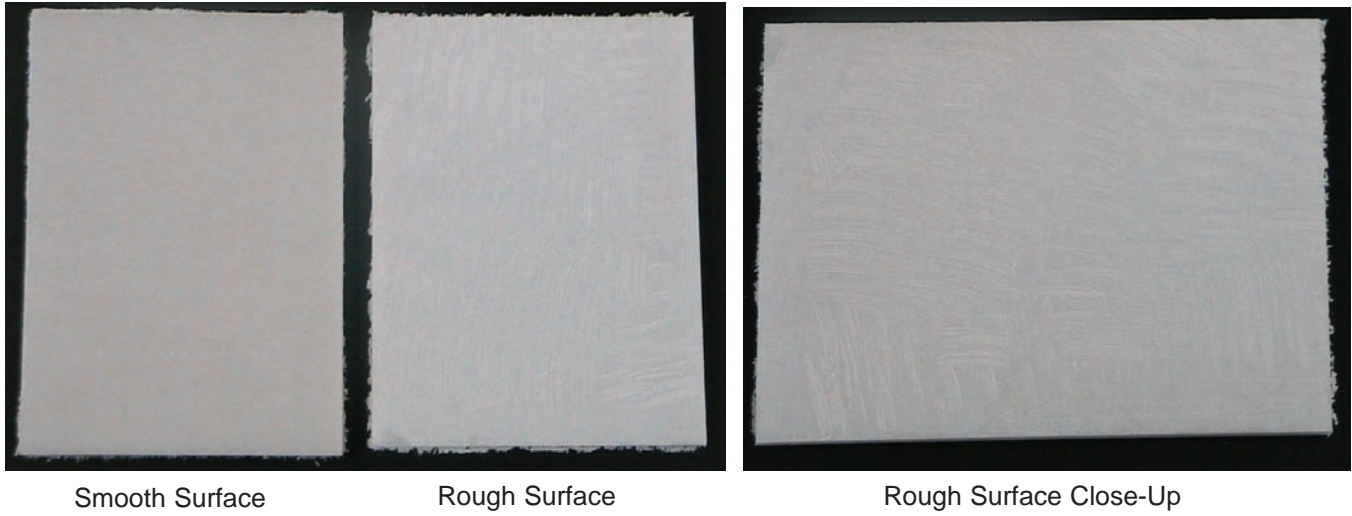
Smooth and Roughened Flexural-Tested Laboratory Specimens
